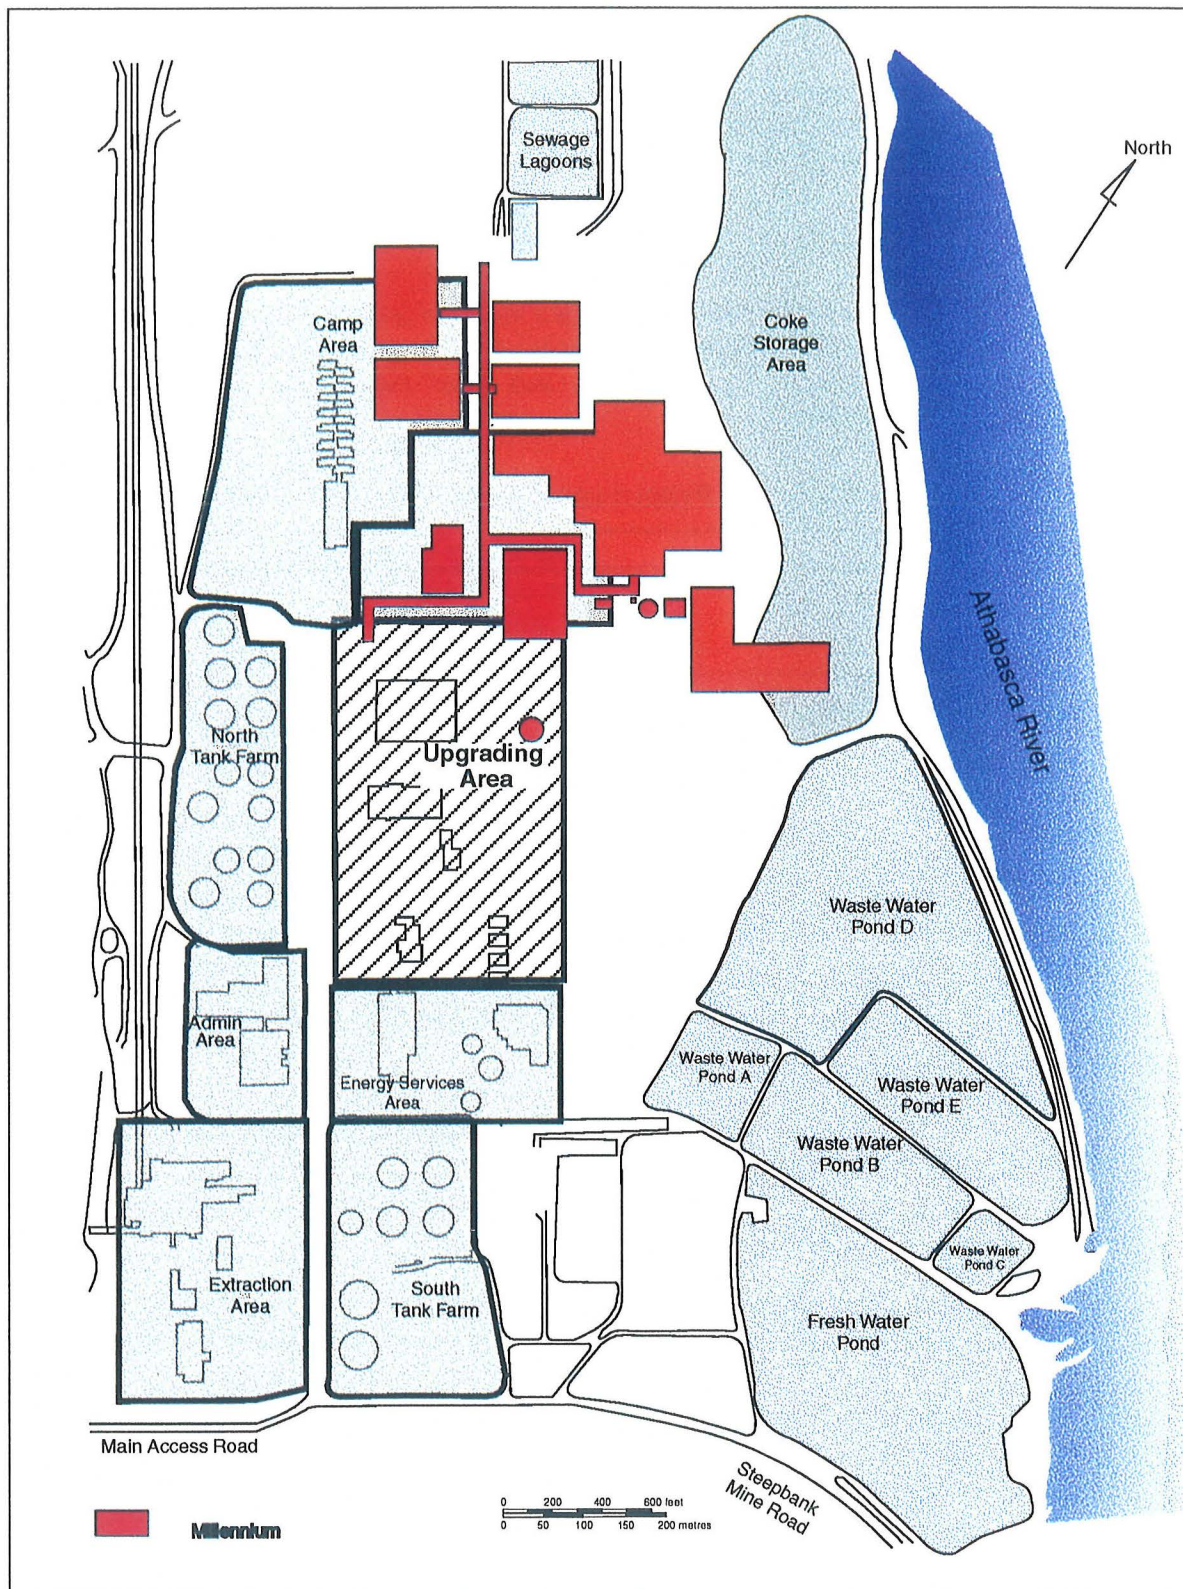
Suncor Plant Site - Proposed Millennium Upgrading Facilities
